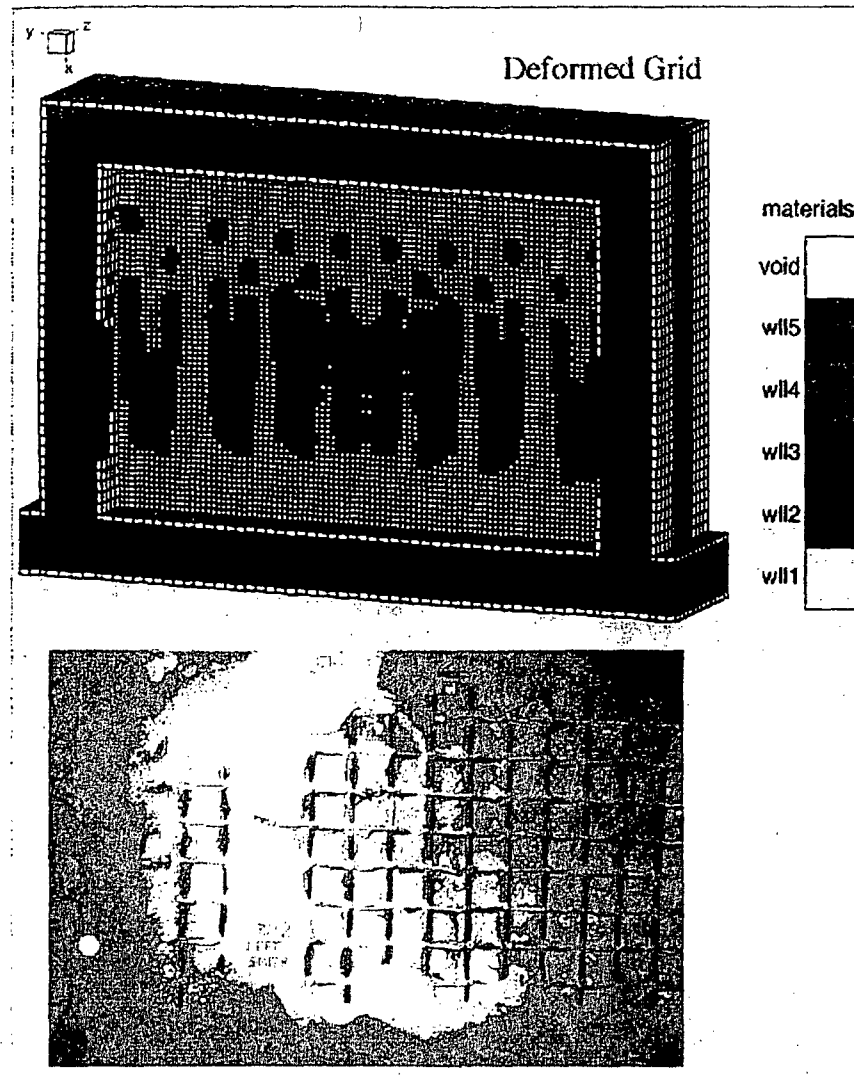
Predicted and Observed Wall Damage for Air-Blast and Fragment Loaded Reinforced Concrete Wall (U).
